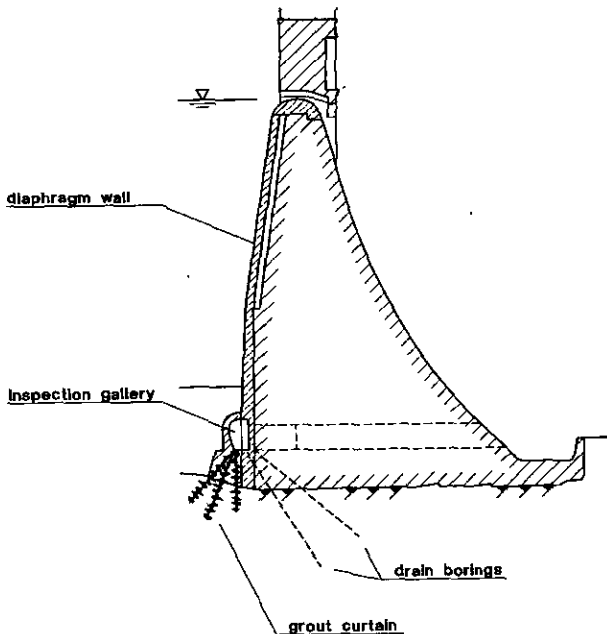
Earlier expensive concept, using a concrete diaphragm wall
